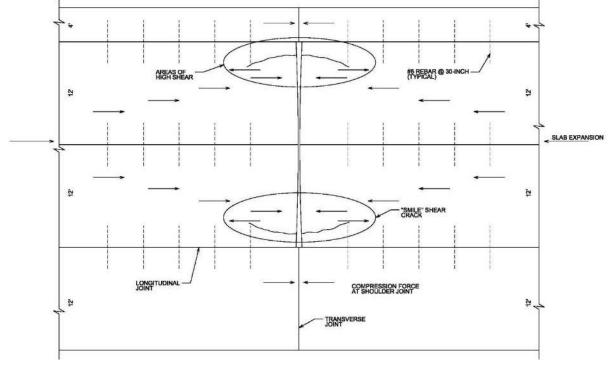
Longitudinal cracking in existing pavement with activated joints when joint movement is restrained by tying on a new adjacent lane
